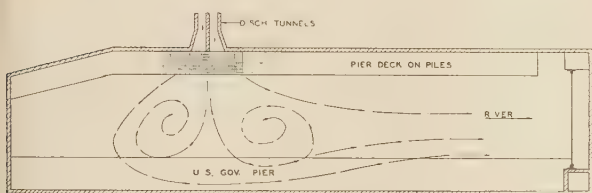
FLOW PATTERN RESULTING FROM DIFFUSING SECTION IN TUNNEL AND USE OF PILING TO BREAK UP FLOW
